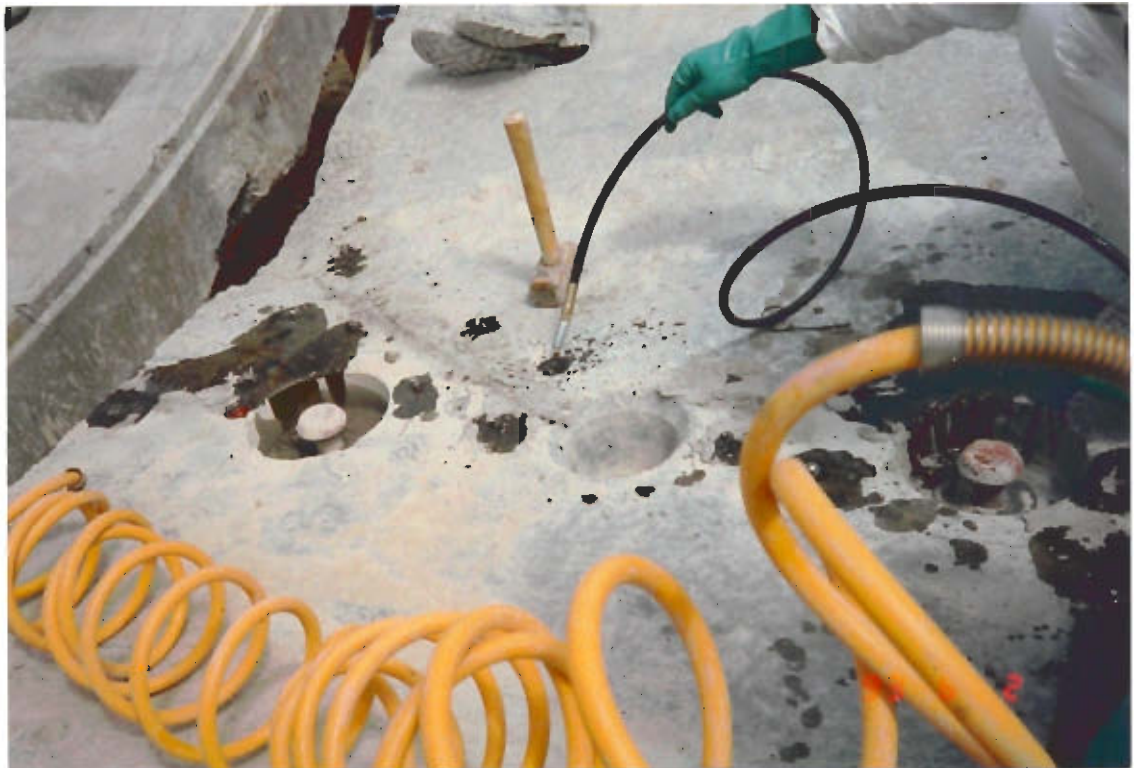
Injection of cracks in a tunnel lining element with epoxy through drilled-in packers. The injection should reestablish the structural integrity and fill out the cracks in order to make the element watertight. The packers are drilled from both sides of the crack at an angle of 45-60°
